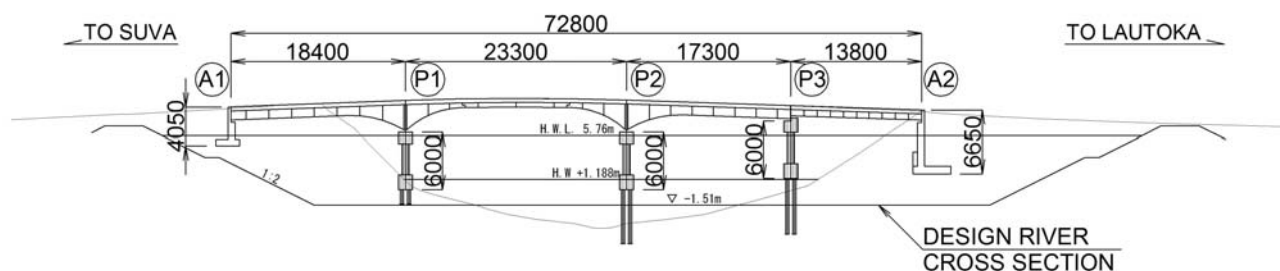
(1) Side View of Existing Bridge (Nadi Town Bridge) Source: JICA Study Team
